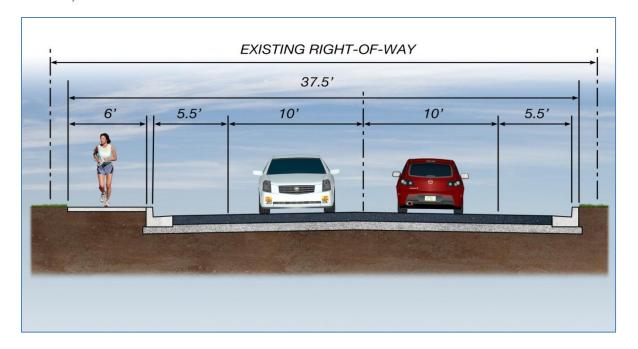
Proposed Roadway Section West of Proposed Movable Bridge
